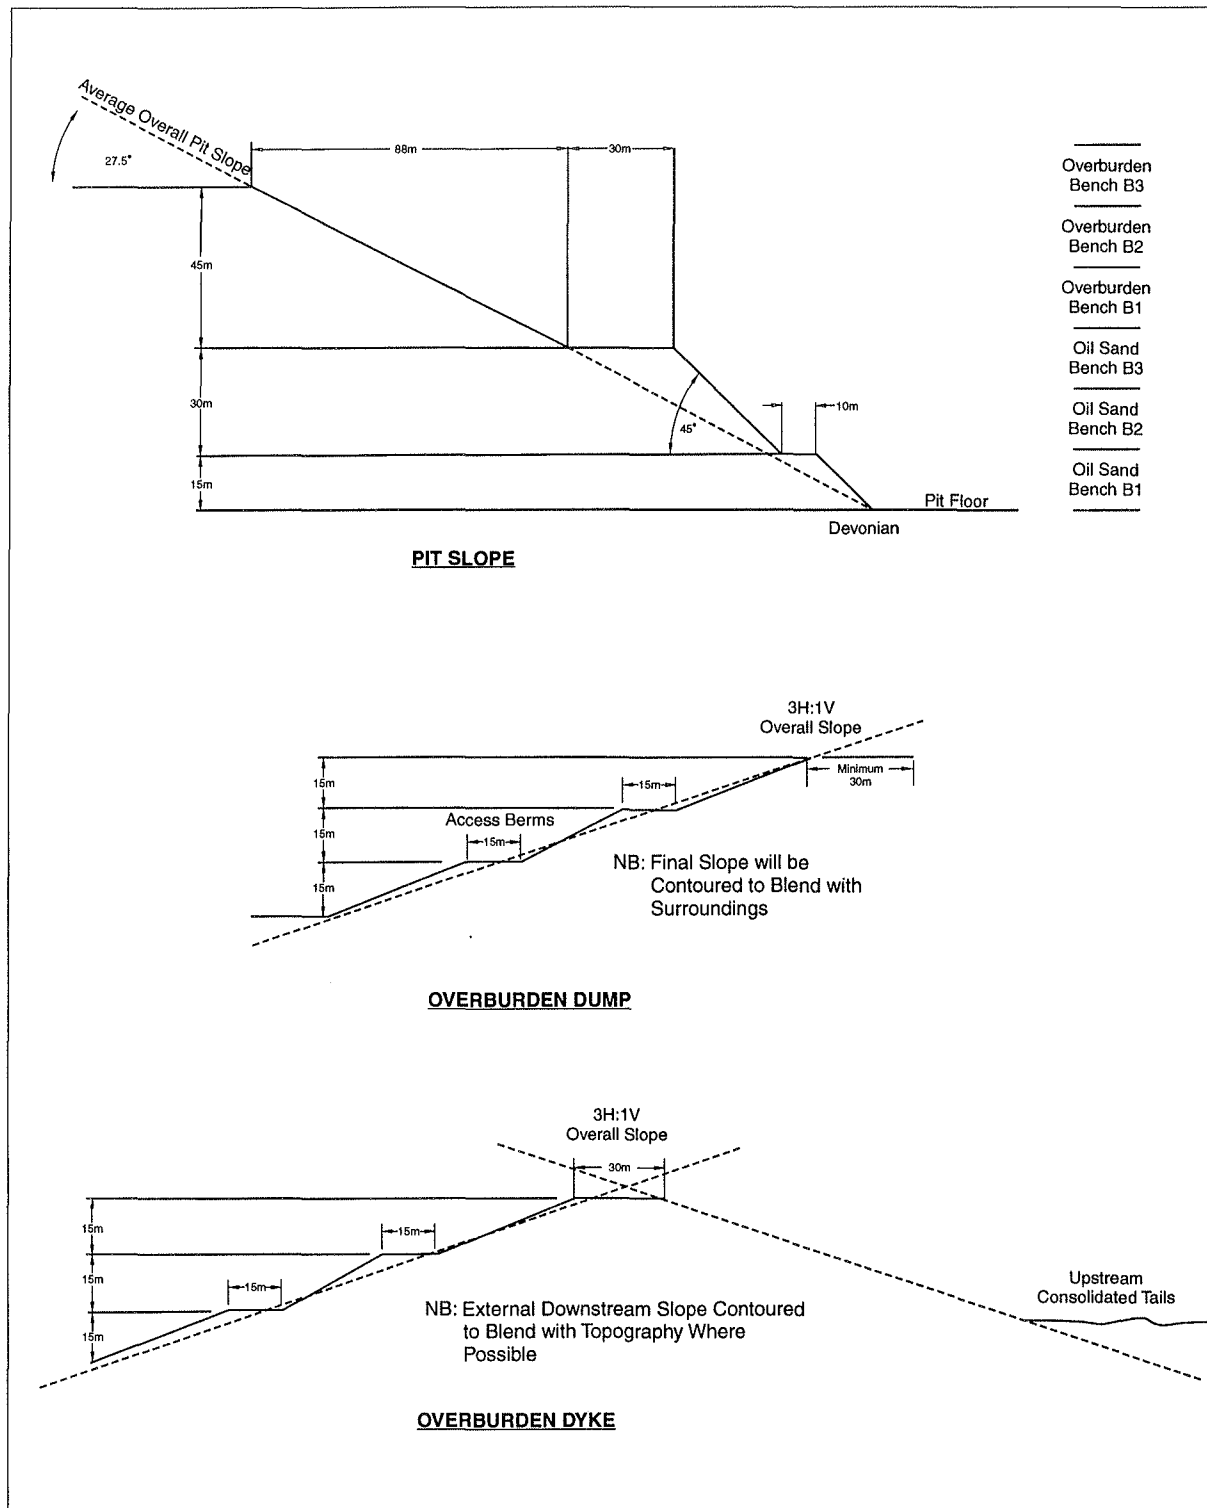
Typical Cross-Sections for Dumps, Dykes and Pitwalls
